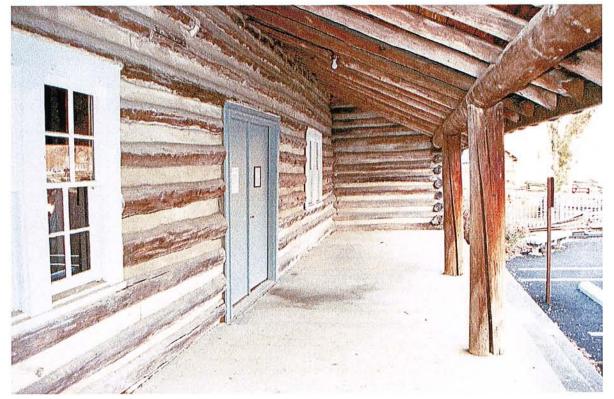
The logs at the top of the wall, under the shed roof of the porch, have rolled out of a plumb position.
